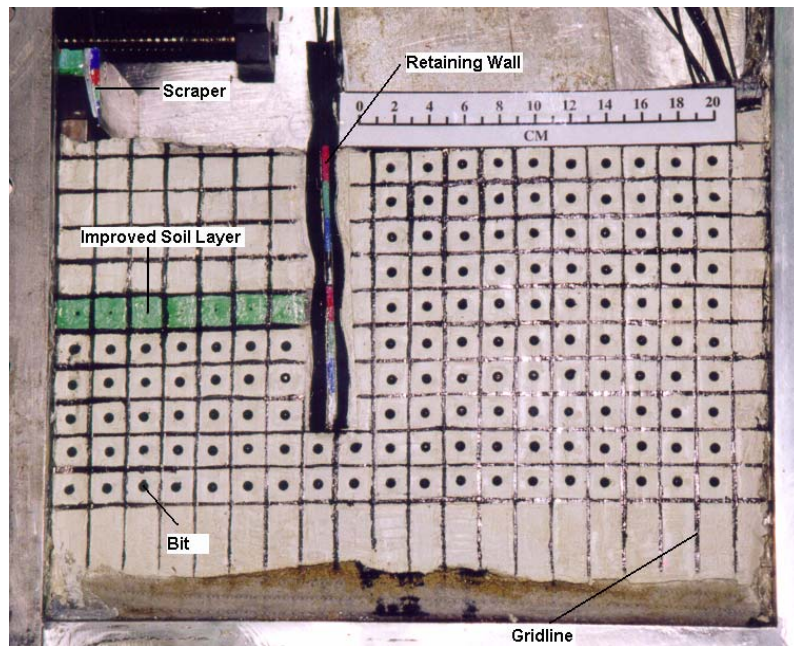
Bits and Gridlines on the model ground prior to excavation test
